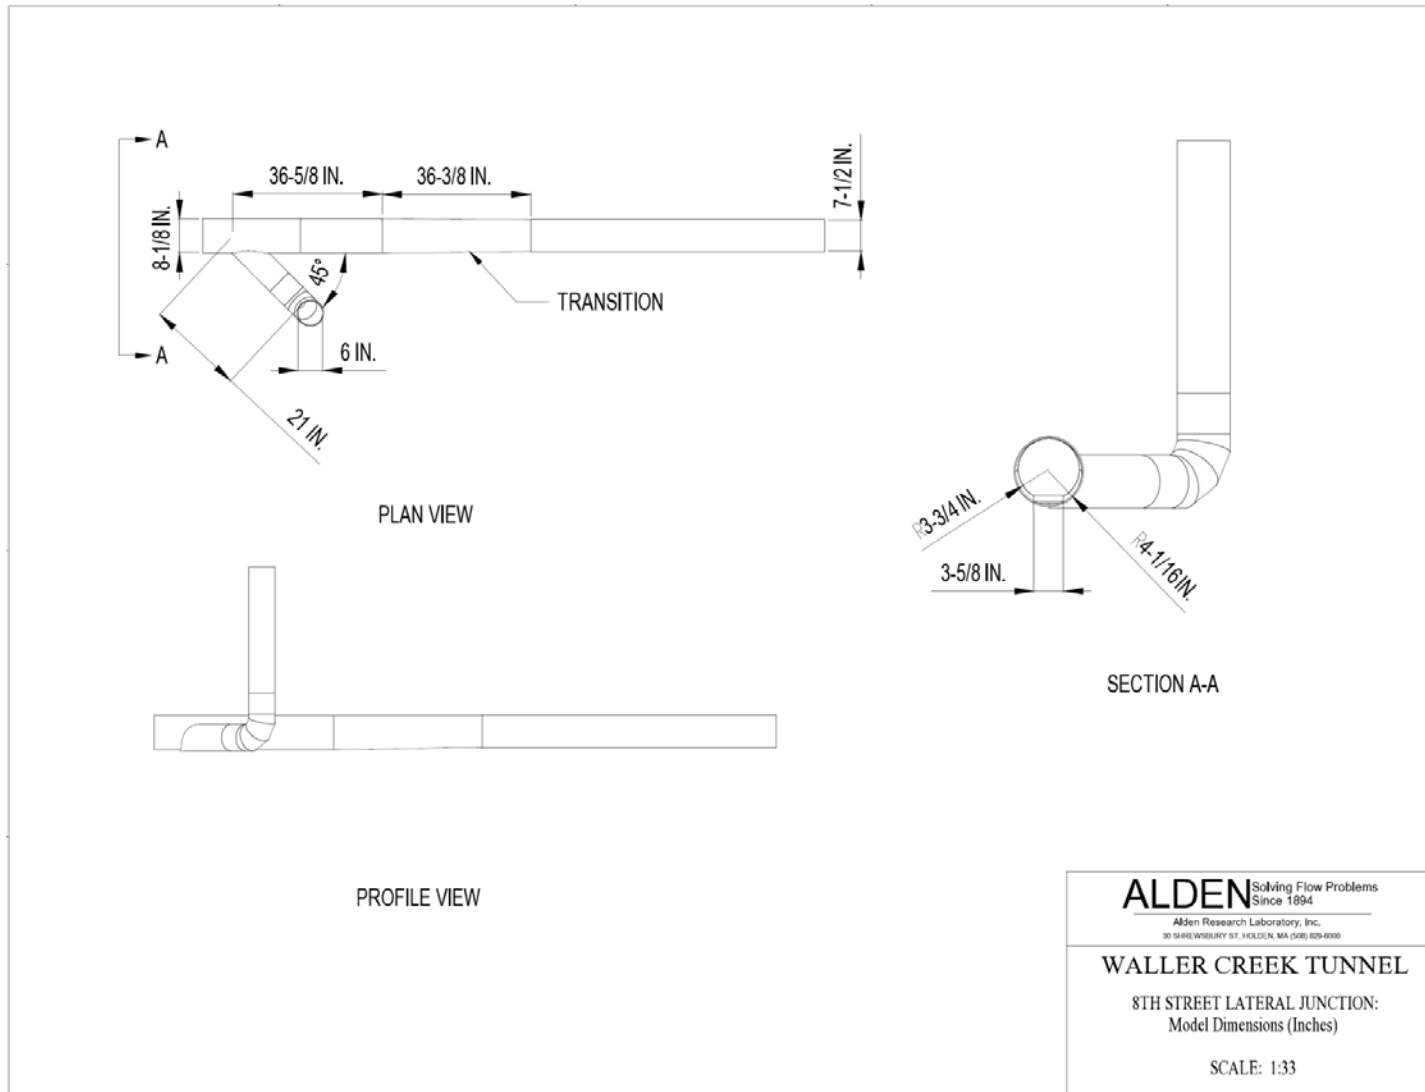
Waller Creek Tunnel Project; 1:33 Scale Model 8th Street Lateral Dimensions
